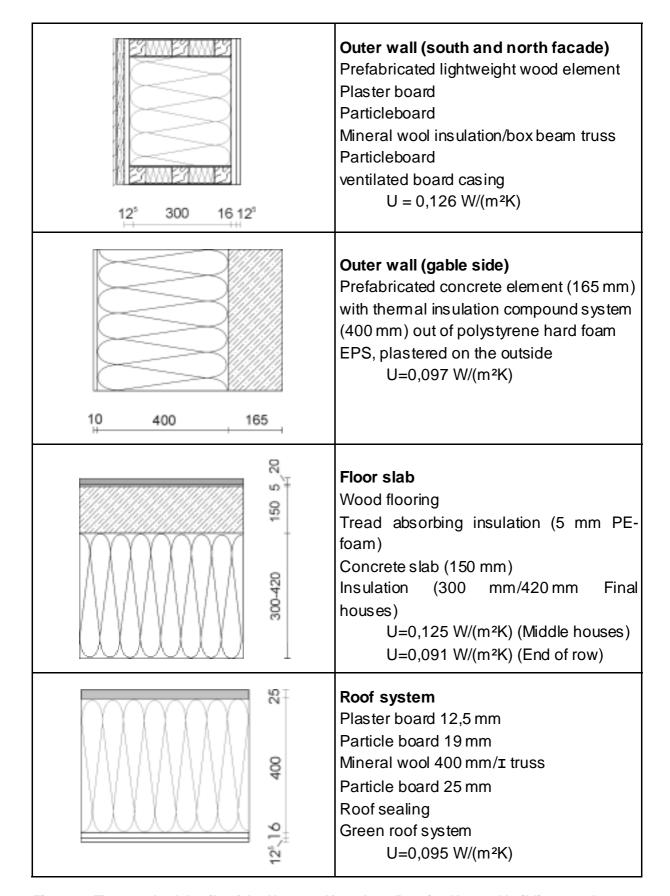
The standard details of the Hanover-Kronsberg Passive Houses' building envelope
